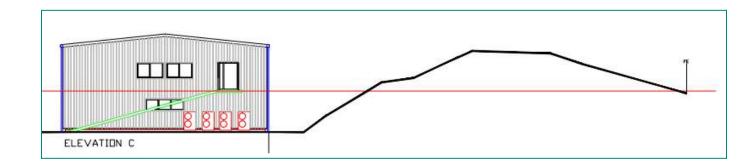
(Extract of rear elevation of existing building adjoining the landscaping)
